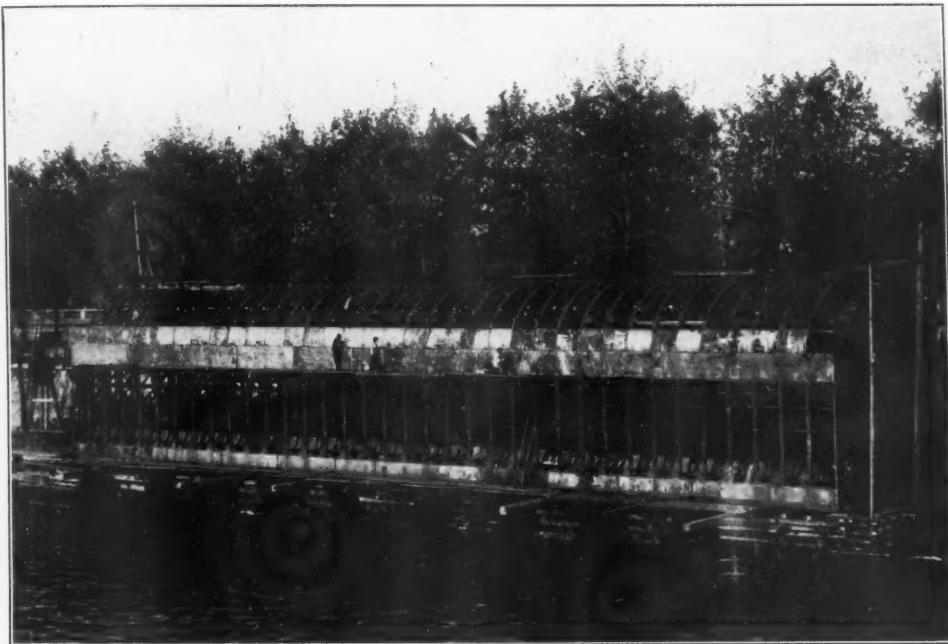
FIG. I. SIDE VIEW OF PARIS TUNNEL CAISSON.
